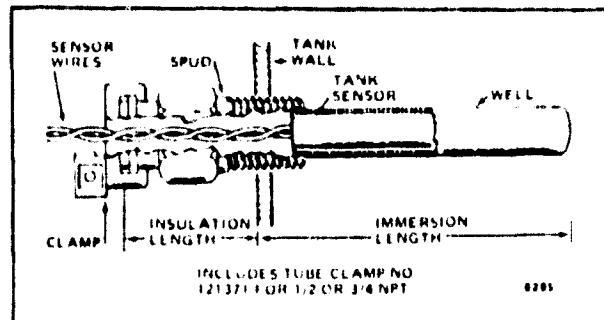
TANK SENSOR INSERTED IN IMMERSION WELL.
